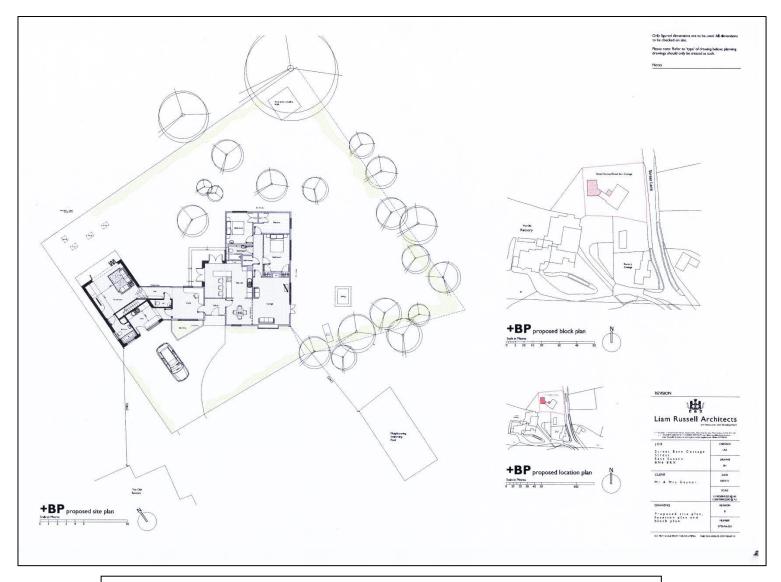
Streat Barn Cottage: Development Plan (adapted from architects drawing)
